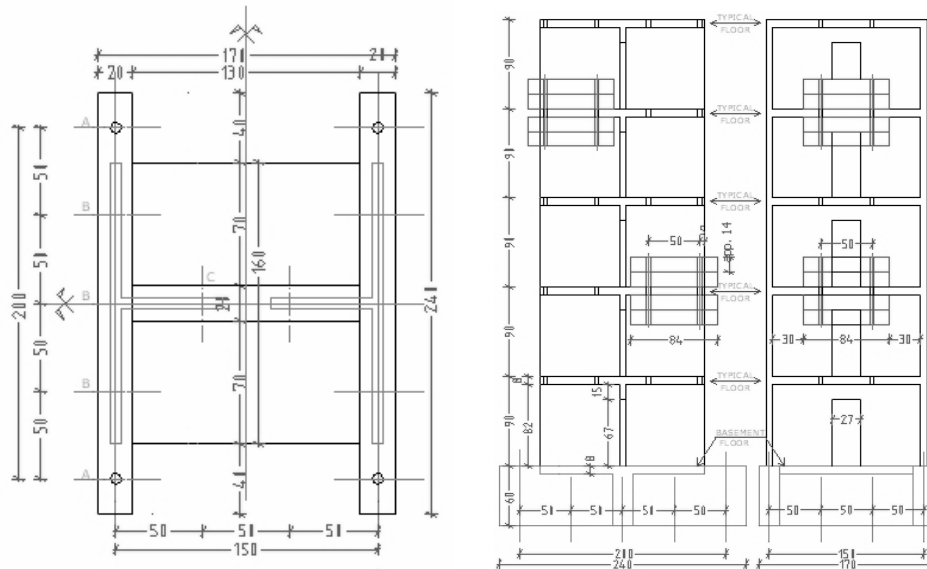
R/C H shaped Slo-wall model elevation and ground floor
